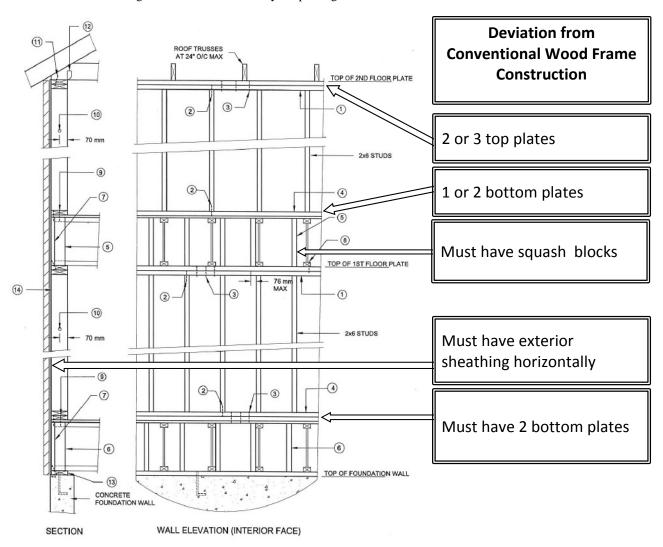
Stud wall construction for the product (wall elevation, interior face)
